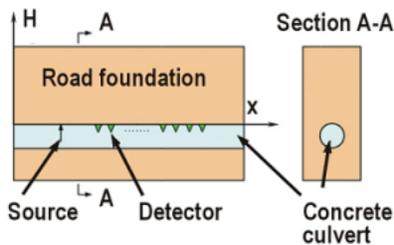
Schematic for observing a system of Rayleigh waves inside the concrete culvert (Sun et al., 2007)
